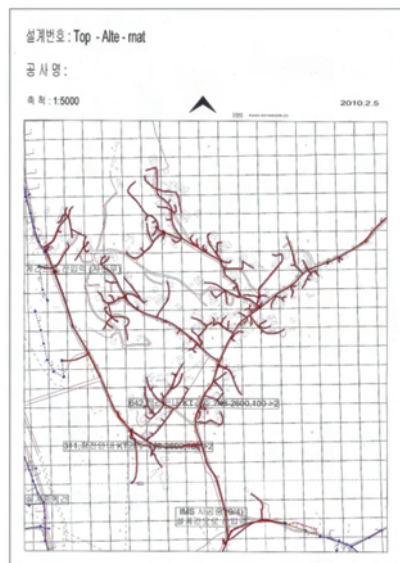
Site Plan by Korea Telecommunication (KT) for Burying Cables in Yangdong
